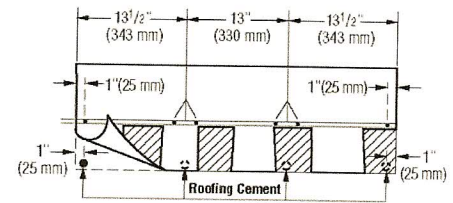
Use six nails and four spots of asphalt roofing cement on steep slopes.
